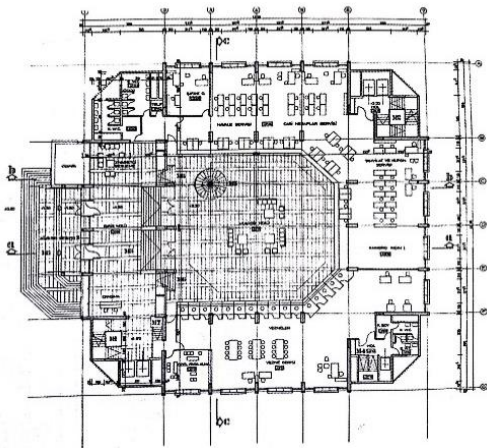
Izmir Central Bank Ground Floor Plan [20]
